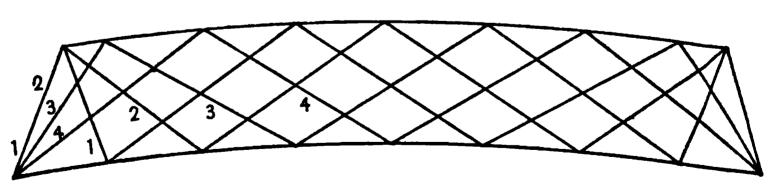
BENT GIRDER OF FOUR SYSTEMS.
